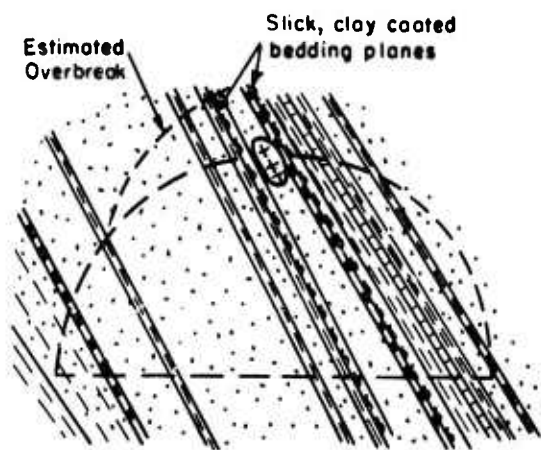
A TOP HEADING EXCAVATED - CASTAIC DIVERSION TUNNEL. (after Arnold et al., 1972)
